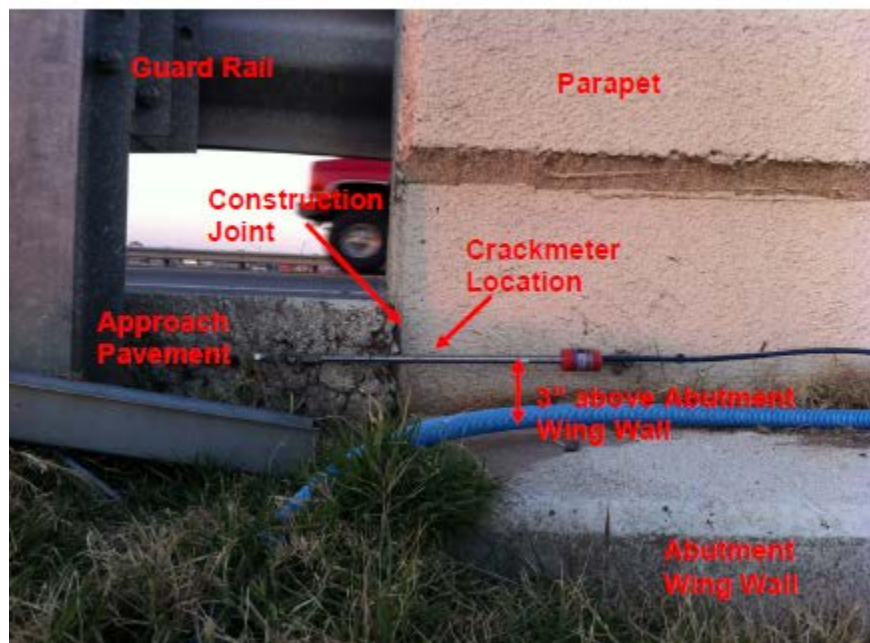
Installed crackmeter attached to approach pavement and parapet above abutment wing wall (Bright, 2012)
